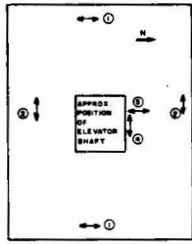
TYPICAL FLOOR PLAN - T/D TOWER SHOWING SEISMOMETER LOCATIONS.
